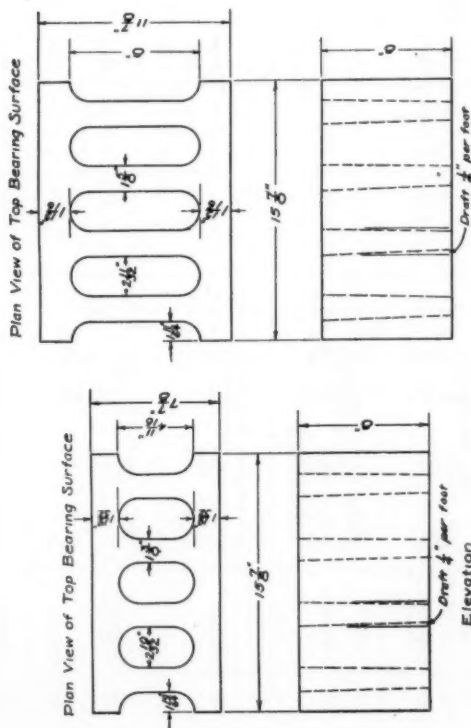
3 CORE BLOCK 8 IN. x 8 IN. x 16 IN.
